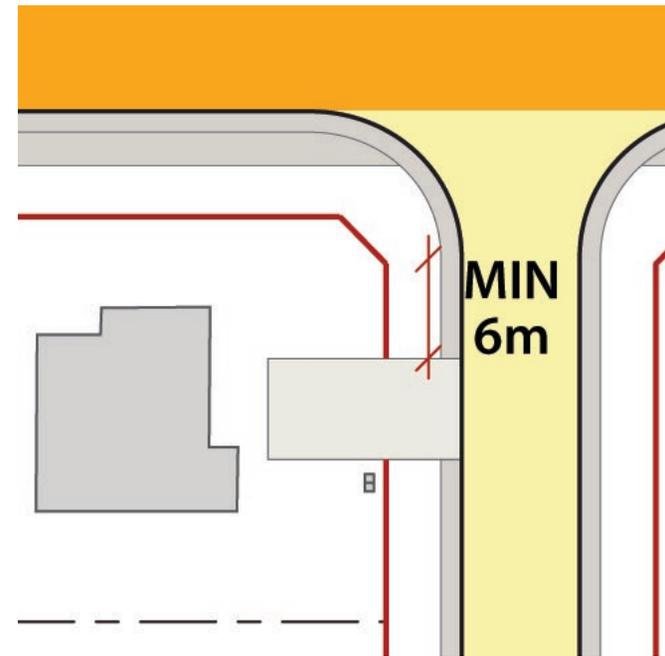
Driveways should be located a minimum of 6 metres from intersections and turning radii.
